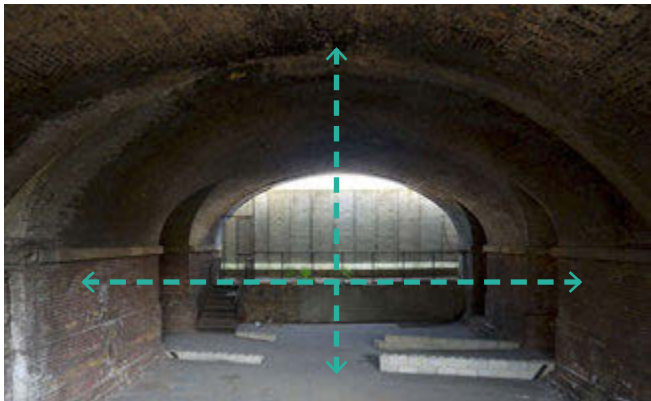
The arches, as existing, highlighting the difference in levels, width and height of arches along the Viaduct
